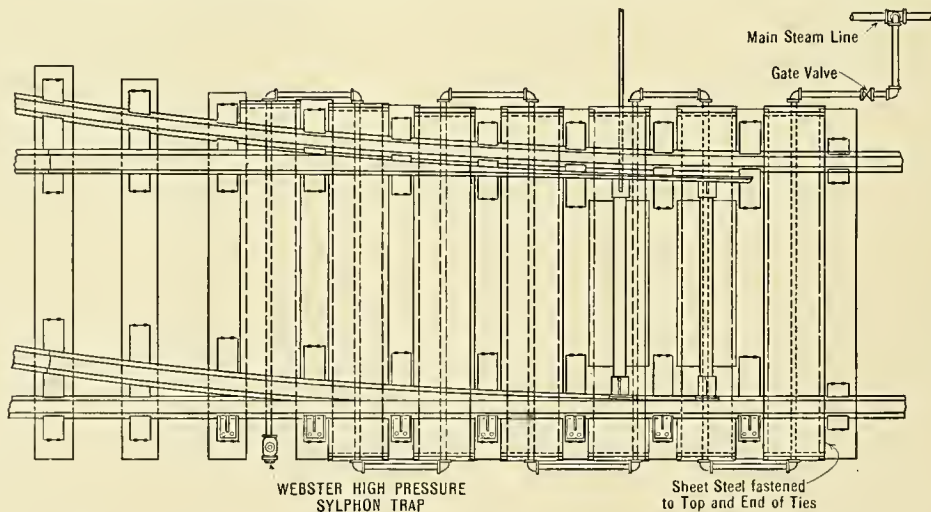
Steam coil arrangement for prevention of freezing of railroad switches.
